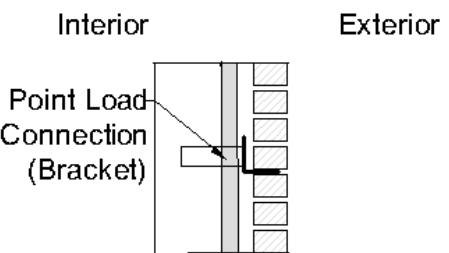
Shelf angles supporting exterior cladding (Section 5.5.5.3).
